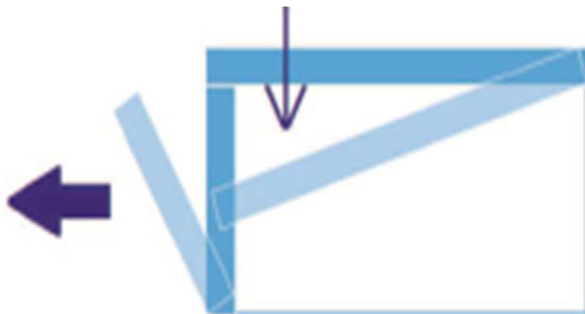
Separation of walls leads to out-of-plane tipping and floor falling
